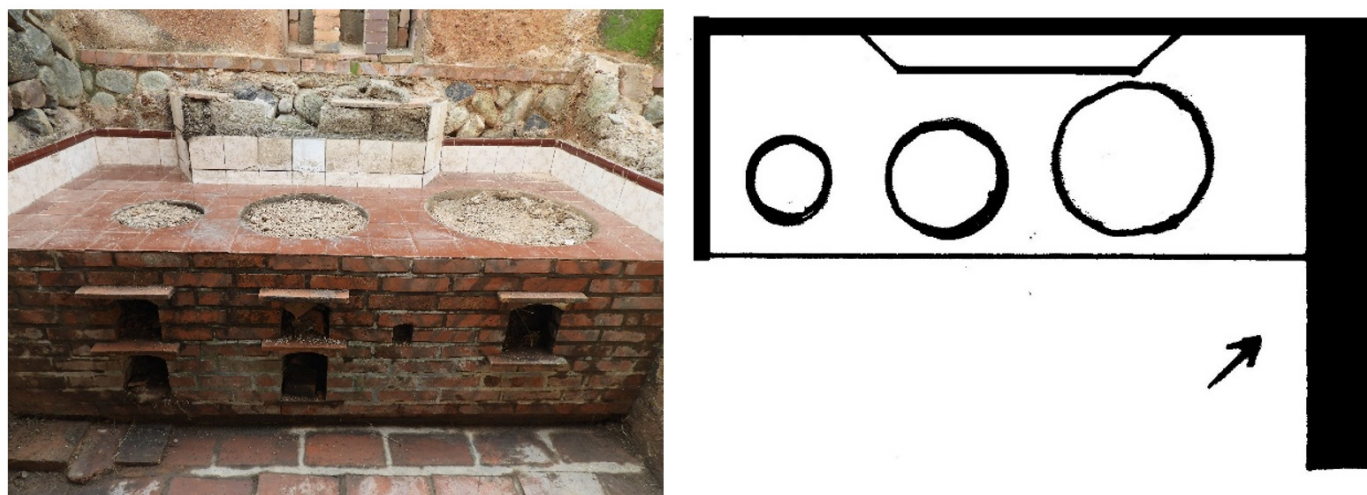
Installation 2, the 3-burners oven after cleaning and excavation
